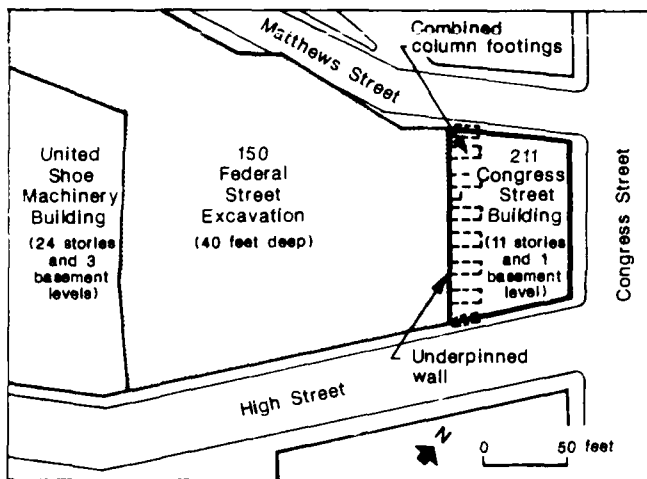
Plan view of 211 Congress Street building and 150 Federal Street excavation.
